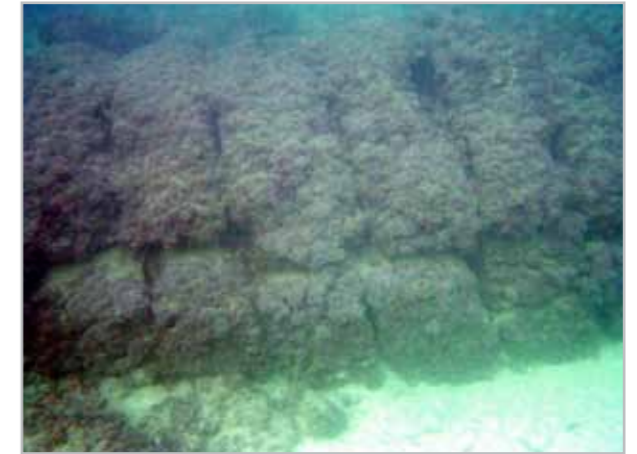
Limestone Blocks Laid in a "Header Shape" used for Construction of the Southern Wall of Jetty, looking north.
